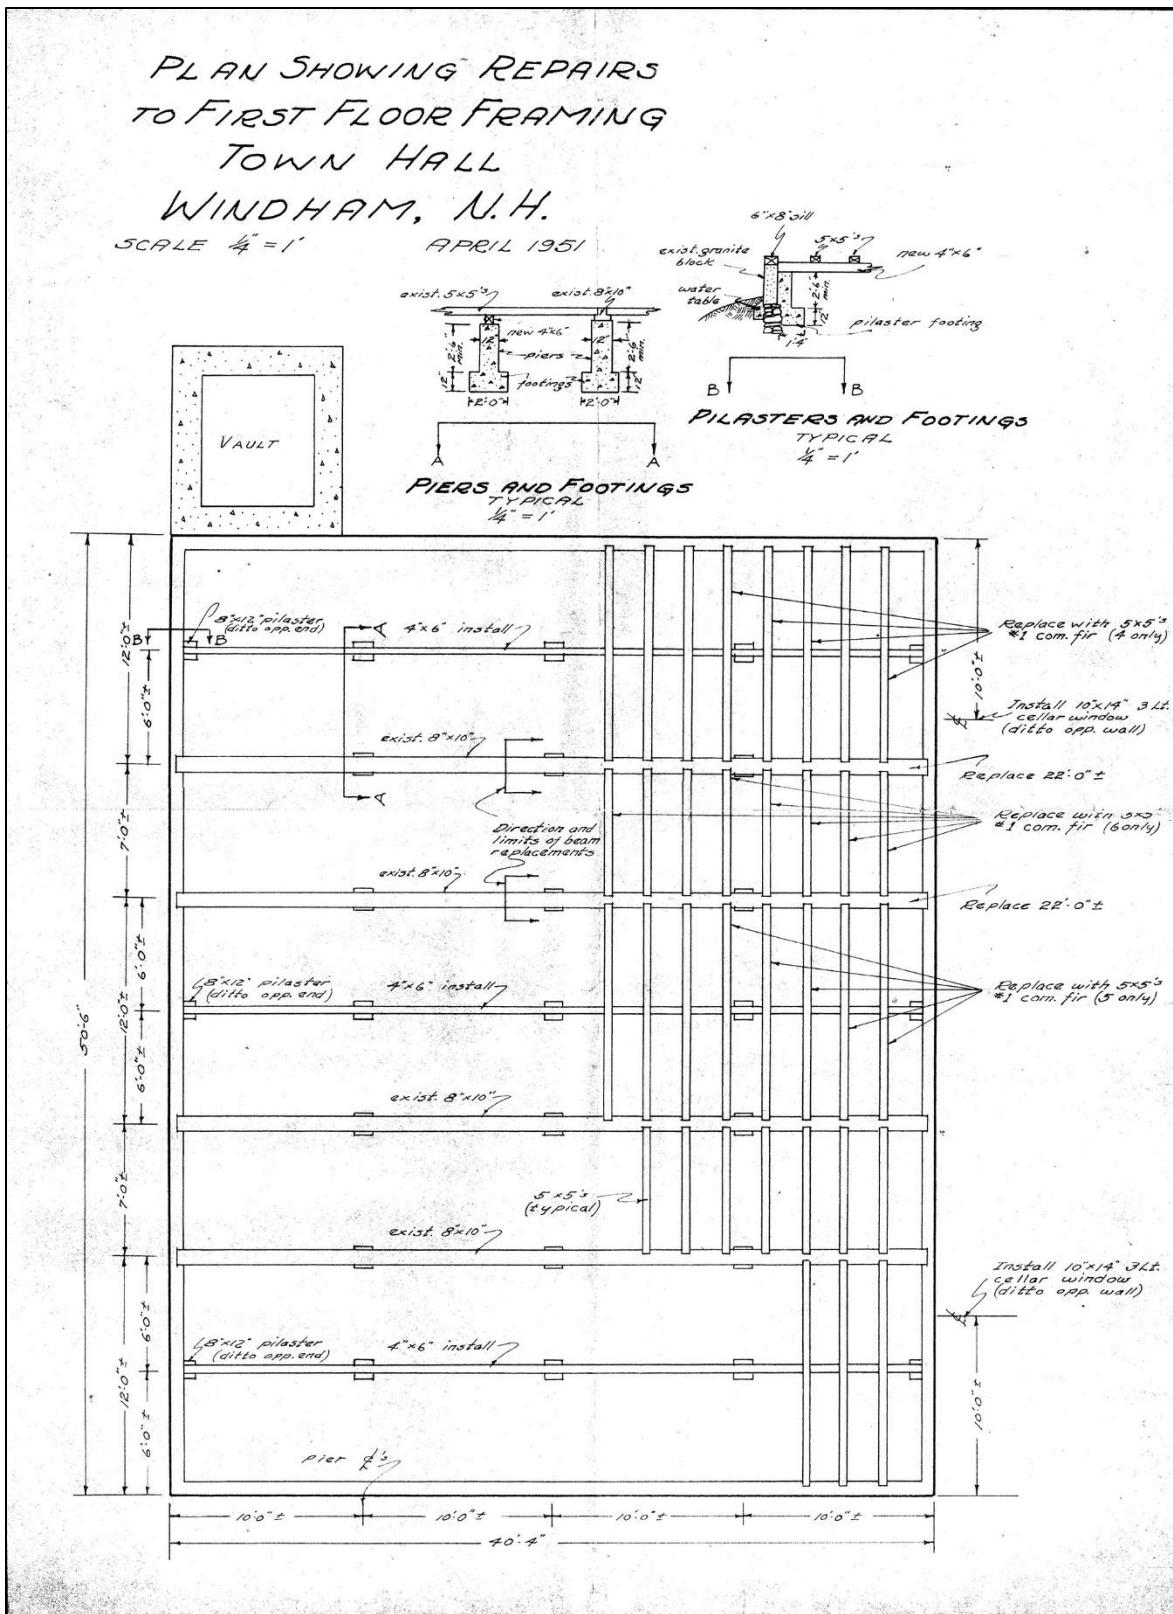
April 1951 Plan of First floor Framing (Town Assessor's Files)
